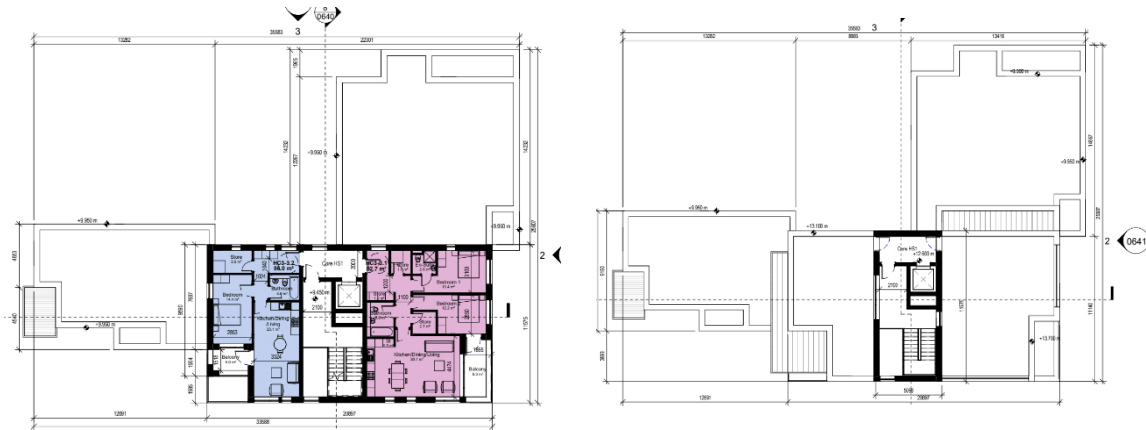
Third (left) and fourth (right) floor plans of Apartment Block HC3.
